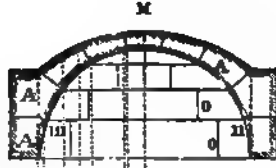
Represents a section M of the voussoirs and an elevation of the soffit of a cloistered arch with a plan A of the soffit.
